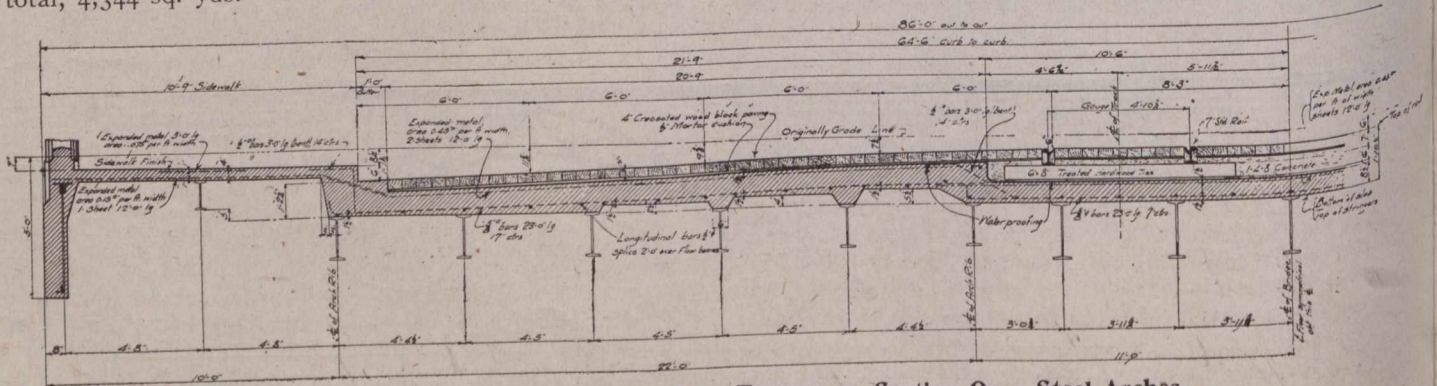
Upper Deck Slab, Half Transverse Section Over Steel Arches.
